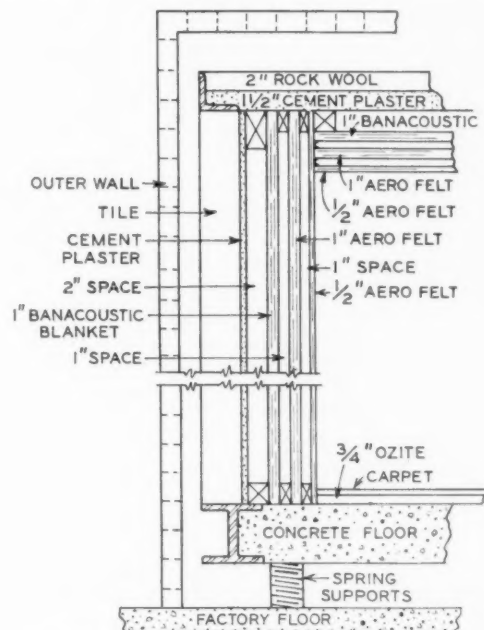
SECTION THROUGH WALL OF TEST ROOM, SHOWING SOUND-ABSORBING LINER
